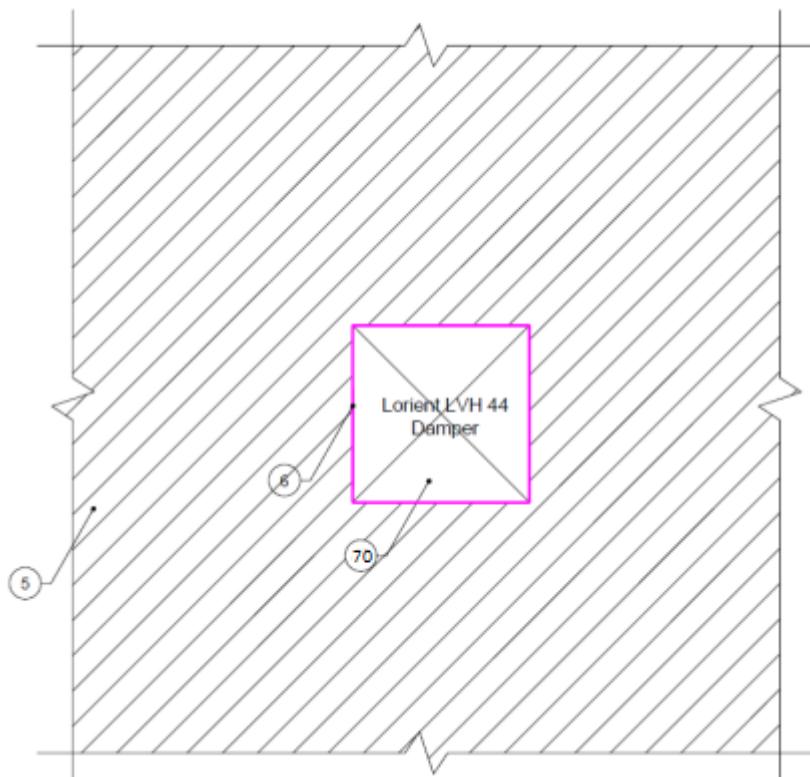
Plan View of Lorient LVH44 or Kilargo damper in TBA Firefly™ Intubatt in Vertical Substrates
